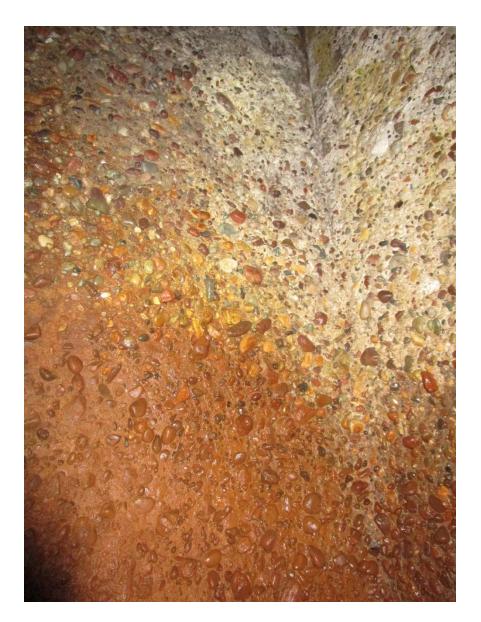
Typical concrete surface deterioration on lower portion of tower
